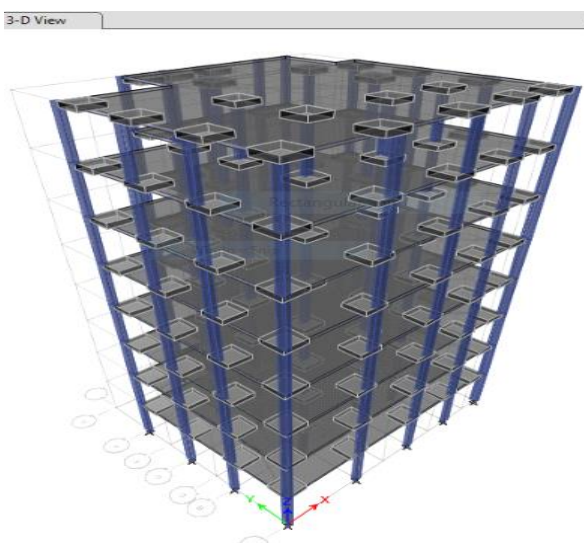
Shows the extruded 3D view of a building after assigning column, drop, slab.
